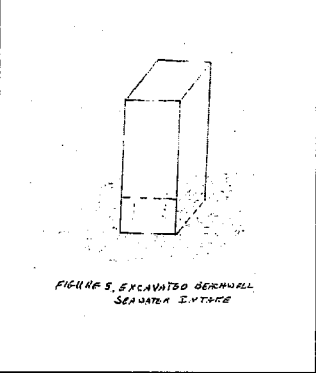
, EXCAVATED BERM WALL SEAWATER INTAKE
